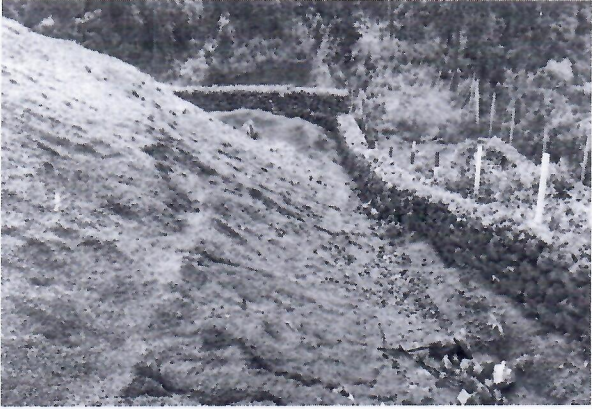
Showing Retaining wall & garland drain around OB Dumps
